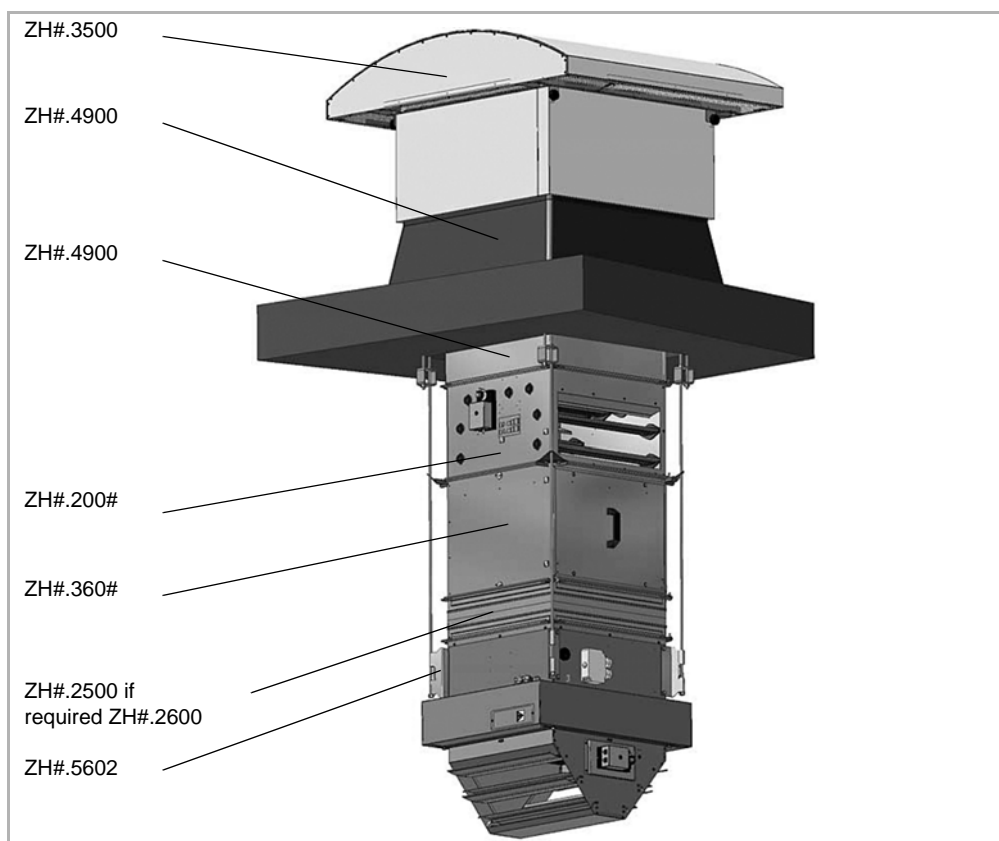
Ceiling mounting of a mixed air unit with accessory items and ceiling suspension (ZHx.5602)
